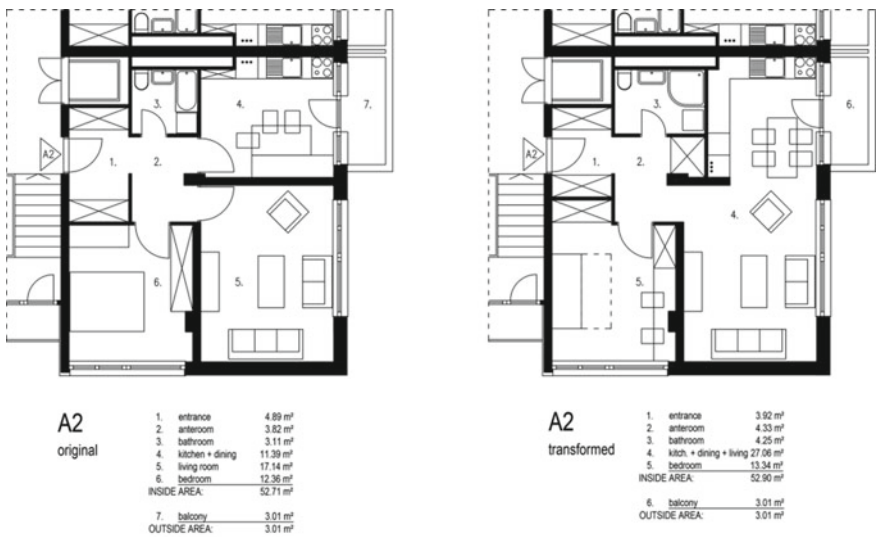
Original and altered condition found in apartment A2 with combined kitchen, dining room, living room, and extended bathroom
